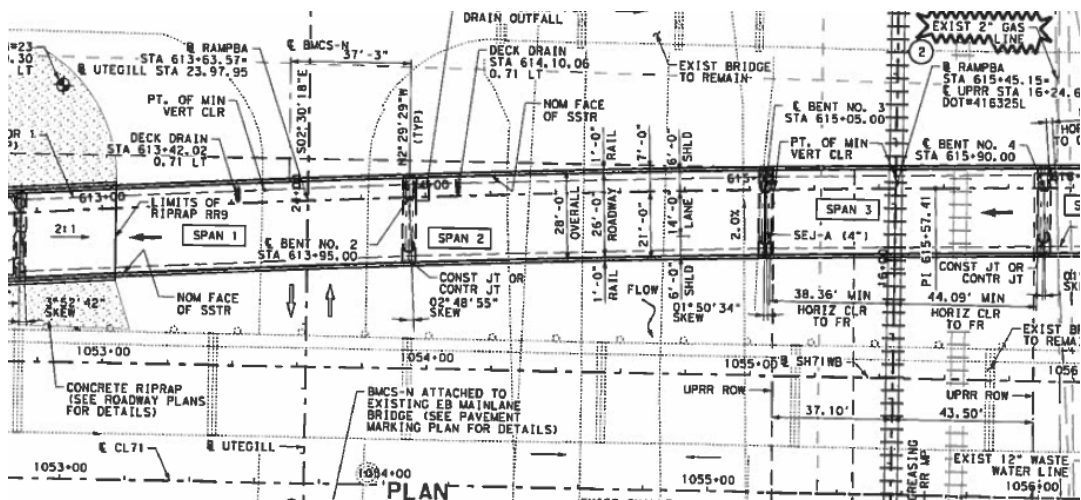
SH71 Plan View Drawing (TxDOT)
